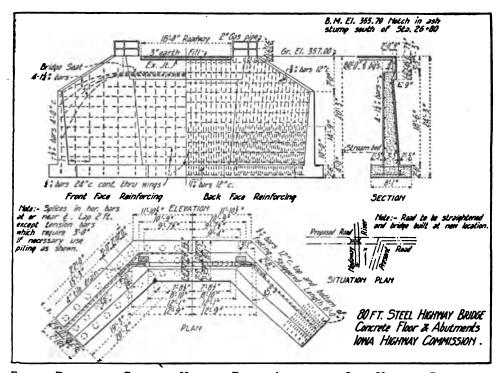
Reinforced Concrete Highway Bridge Abutments. Iowa Highway Commission.
